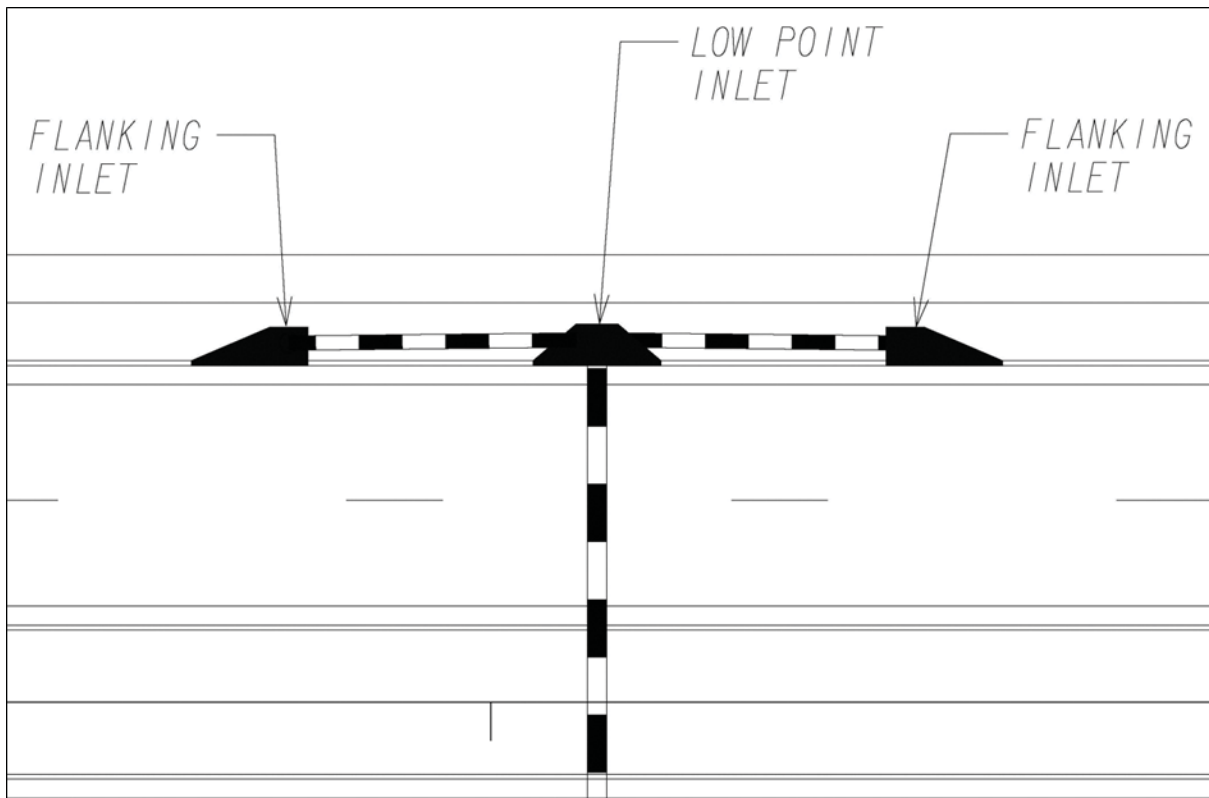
Example of typical placement of flanking inlets (plan view)
